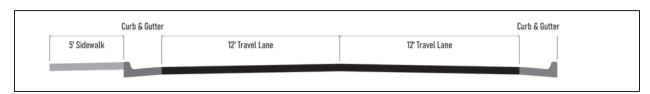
Vasquez Boulevard Proposed and Existing, Sheet 1
